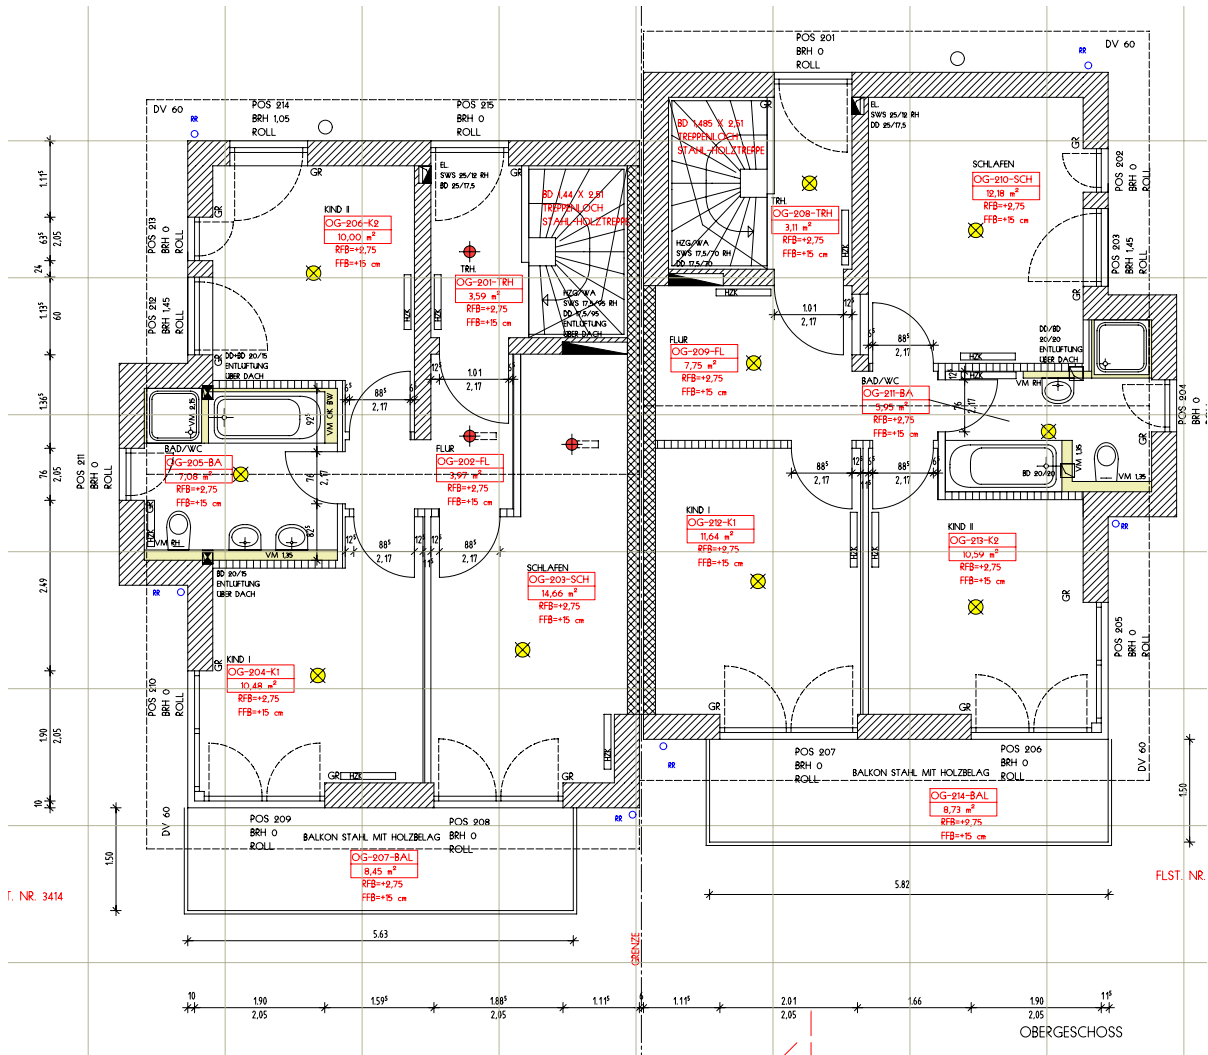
Single family house building plan—first floor. The half section on the left is used for the analysis [149].
